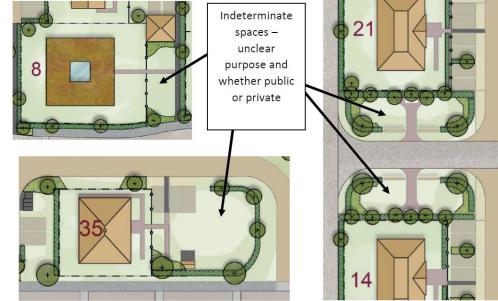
Extracts from the Site Layout Plan to show indeterminate spaces within the layout
